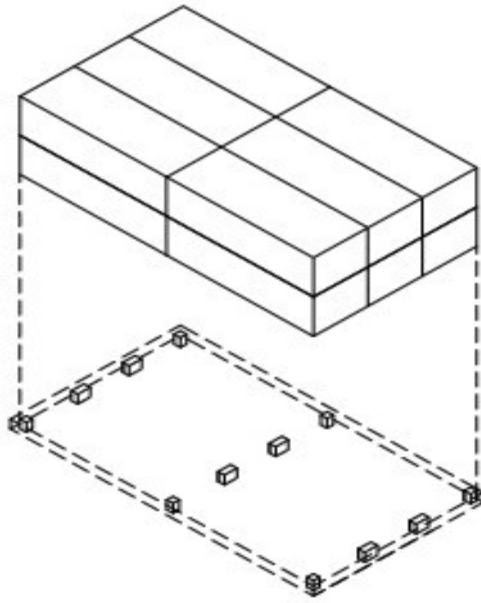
Isolated footings for modules' foundation (Garrison and Tweedie, 2008)
